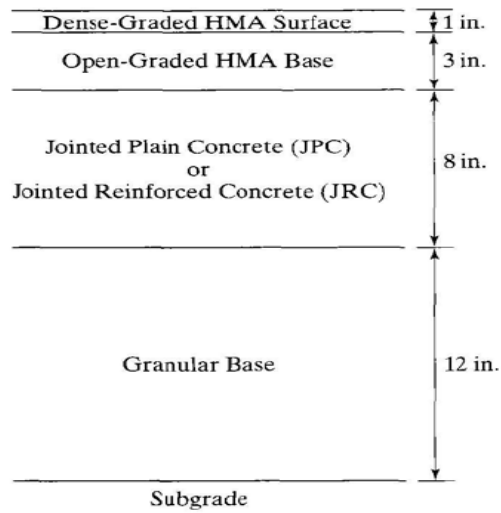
Composite pavement cross-section (Huang, 2004).
